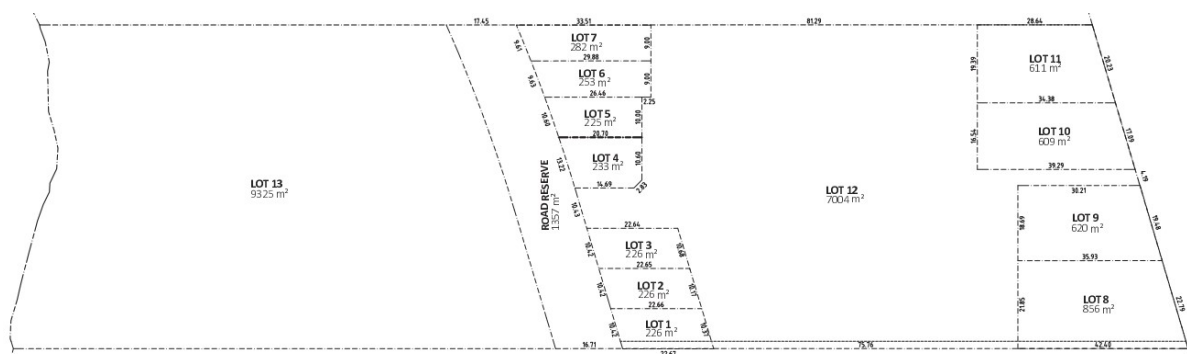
An extract of the lot layout plan, showing the locations and sizes of proposed allotments.
